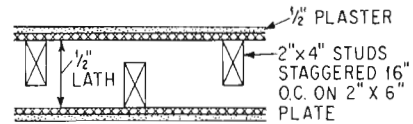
A cross section of a sound-insulating partition. Wooden walls should be constructed in this manner to reduce external noise.
